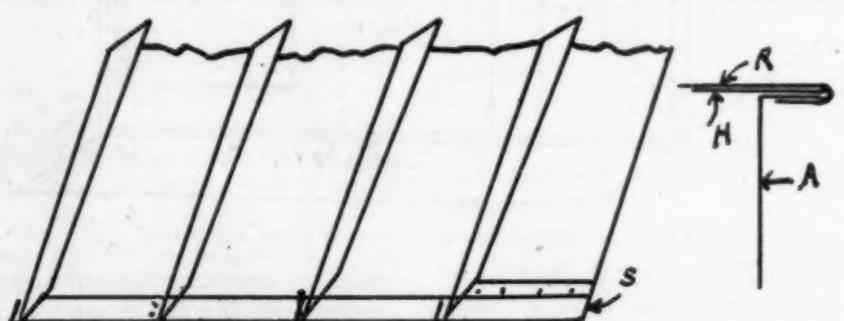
Eave Finish. R—Roof; H—Heavy Iron Strip; A—Angle Strip; S—3-Inch Iron Strip
